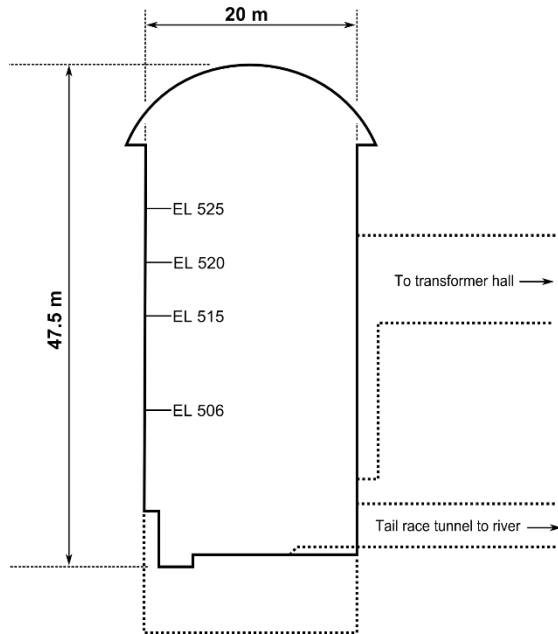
Cross section of the machine hall cavern. Elevations are given in meters
